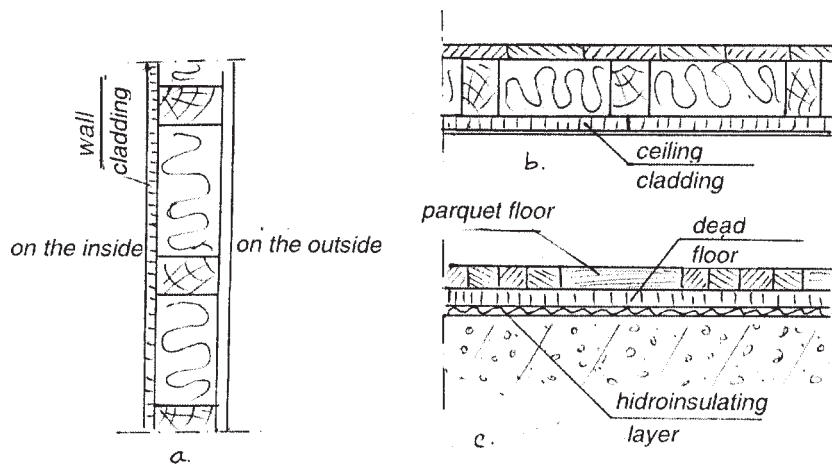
Possible uses for the boards made of composites with wood chip- or fibre-matrix and mineral binders: a – wall cladding on the inside; b – ceiling cladding; c – dead floors
